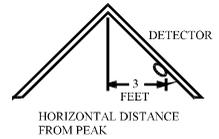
Recommended location to mount smoke detectors in rooms with sloped, gabled, or peaked ceiling
